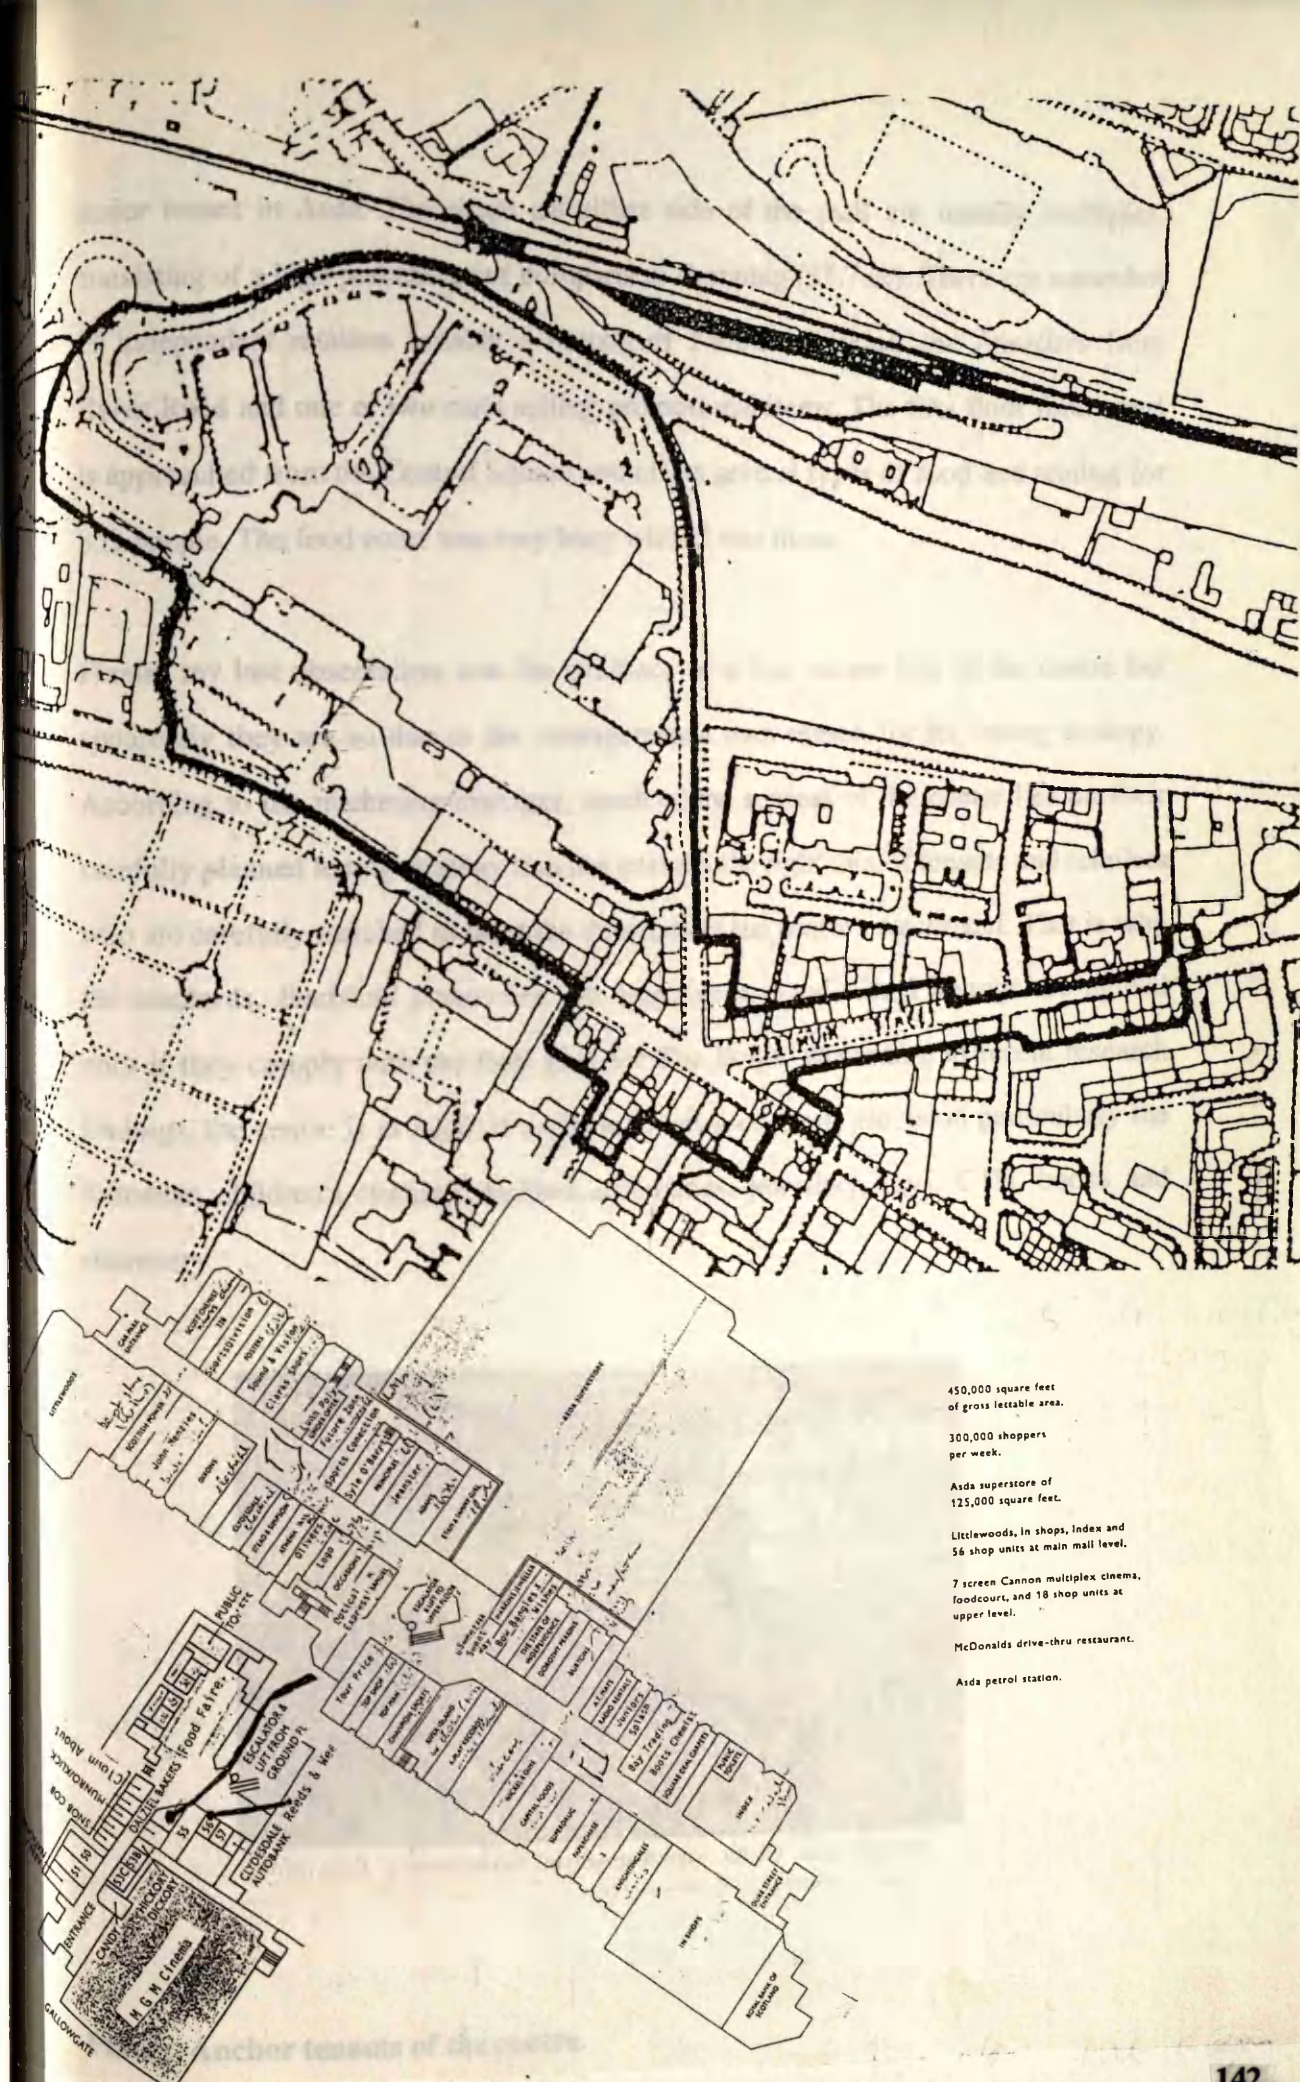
PLAN SHOWING TENANT MIX-PARKHEAD FORGE MALL
